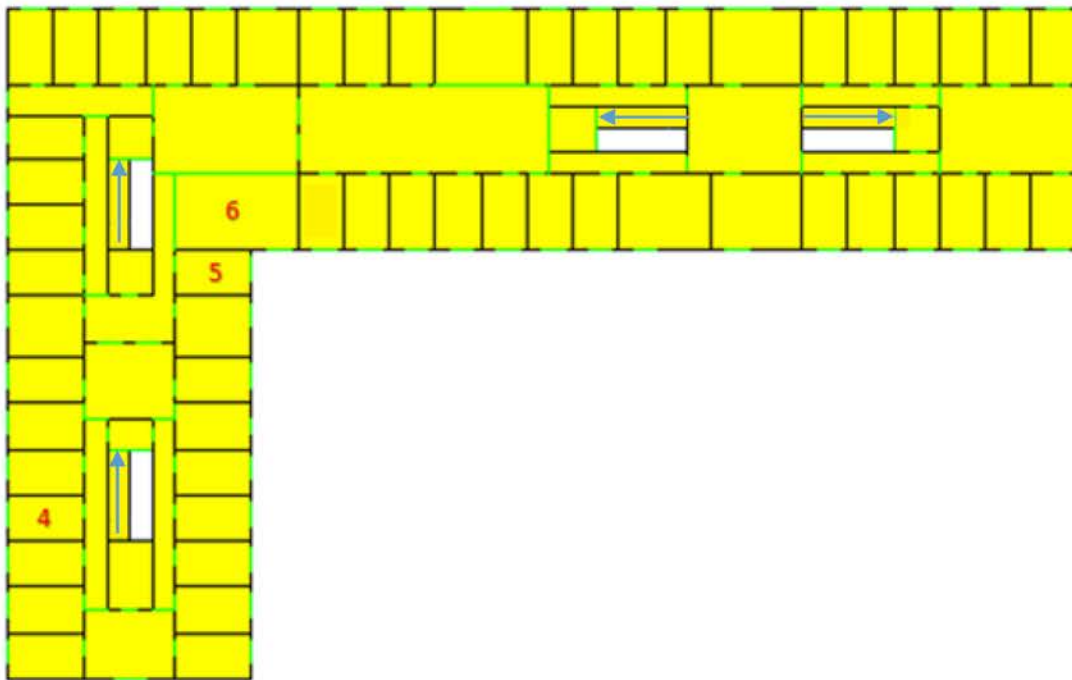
Simplified room layout for 50 George Square 2nd floor.
